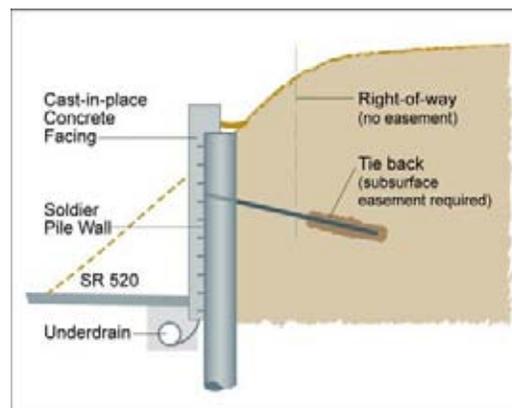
Typical Soldier Pile Wall in a Cut Slope
